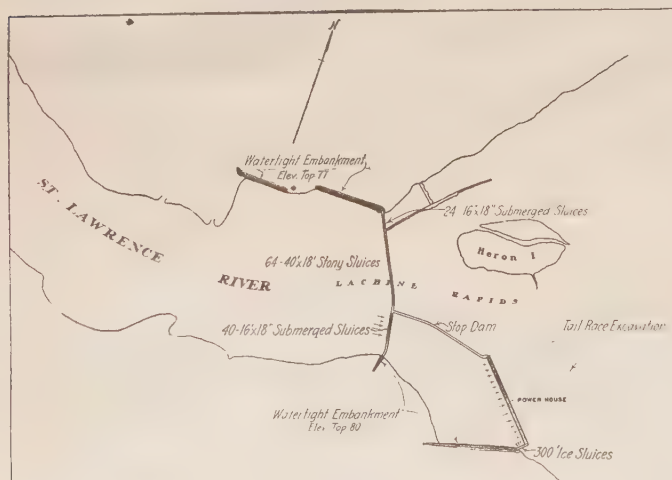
PROPOSED INSTALLATION AT FOOT OF LACHINE RAPIDS RECOMMENDED BY WOOTEN-BOWDEN REPORT
